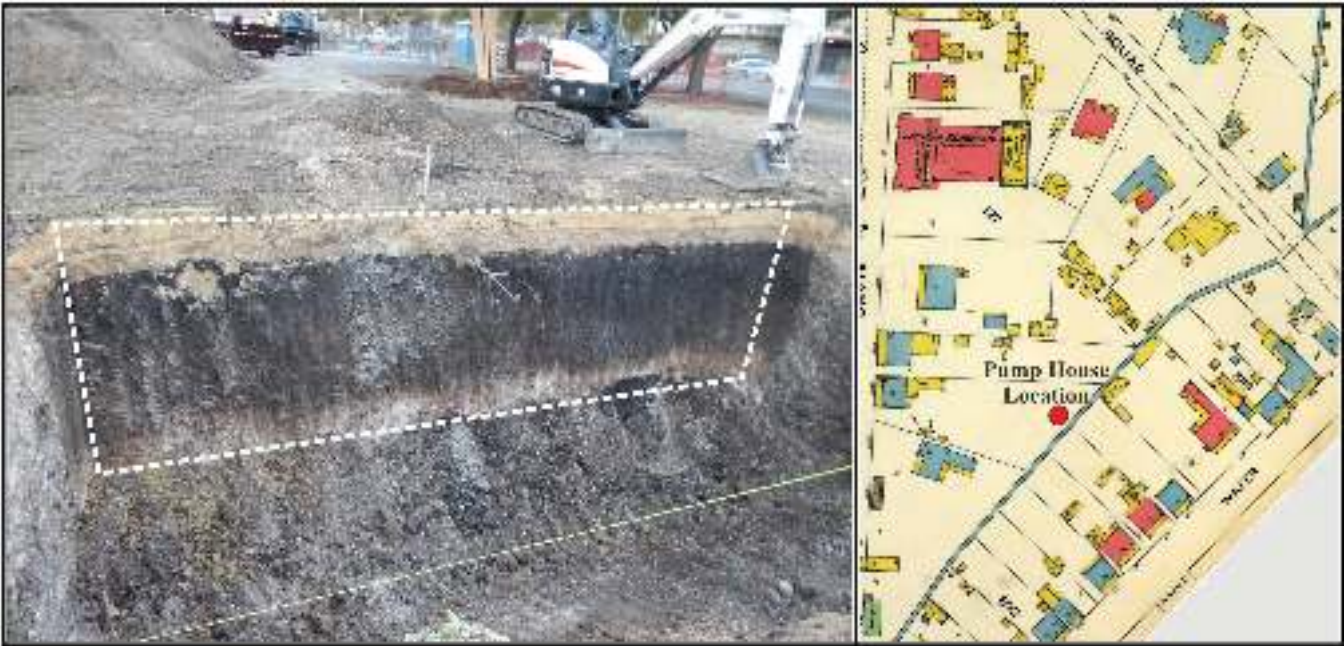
Left: soil profile (outlined in white) in Splash Pad pump house excavation. Right: location of pump house on 1896 Sanborn Fire Insurance Map (Sanborn 1896).
